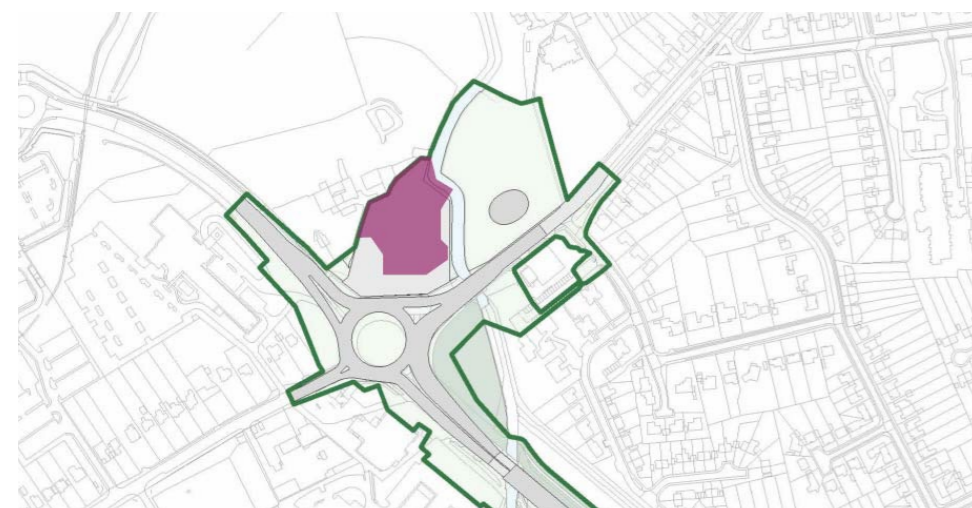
Site Location - Longbridge Roundabout Site Welfare Facility
